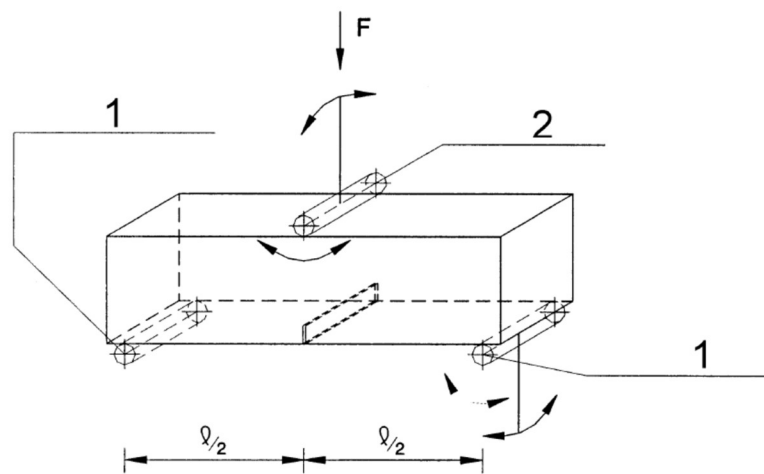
Test set-up: 1) supporting rollers; 2) loading roller; F) applied force
